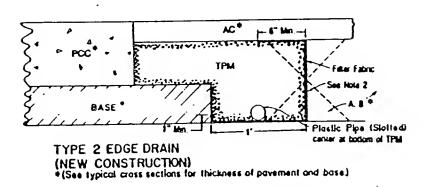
Typical cross sections of underdrain trench (Wells, 1985)
